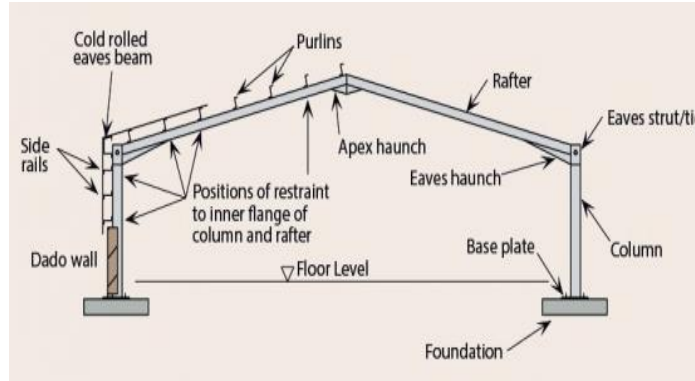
Single span symmetric portal frame (https://www.steelconstruction.info/Portal_frame)
